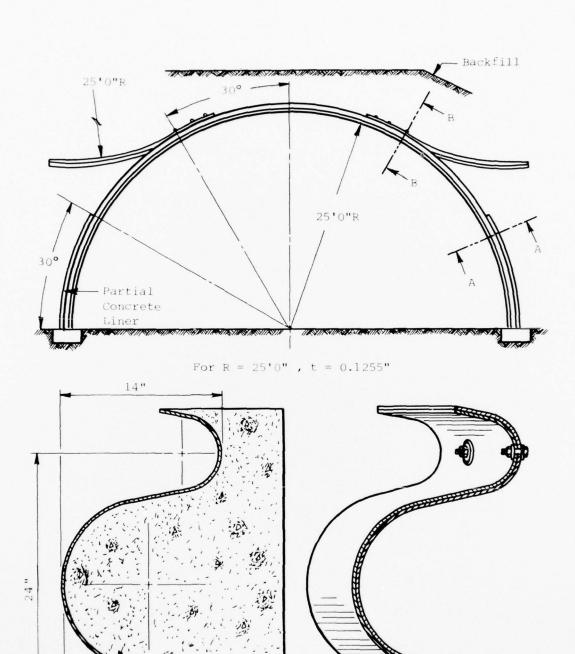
Aircraft Shelter Arch - 50-Foot Span
